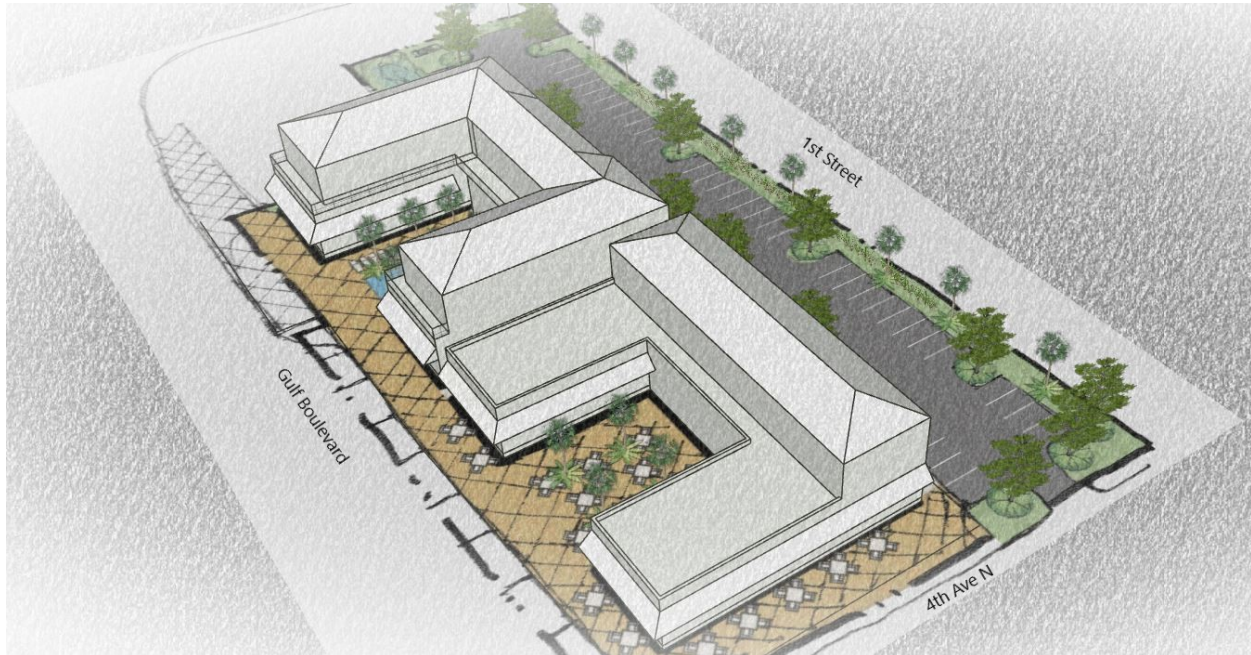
Conceptual Site Plan Sketch for the Crabby Bill's Site in Indian Rocks Beach.
